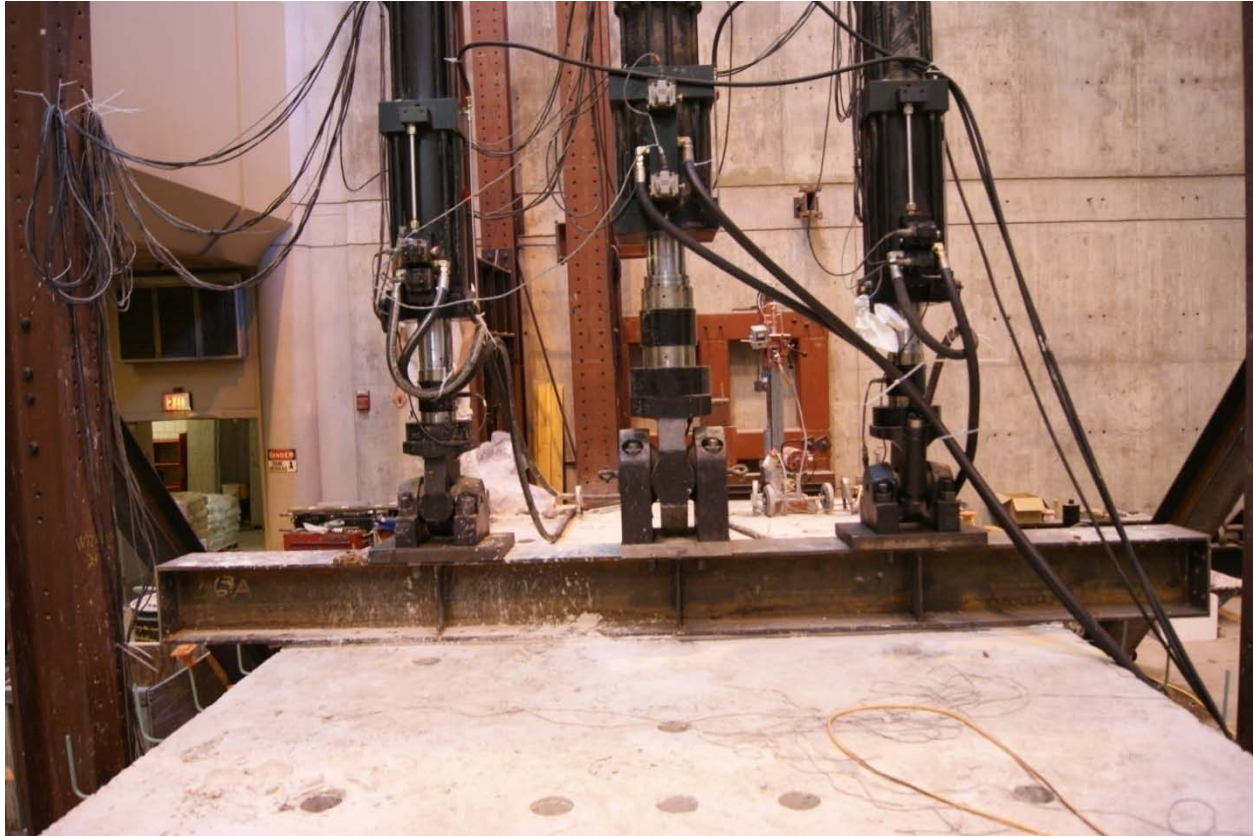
Photograph of tri-actuator load setup and transverse loading beam utilized during ultimate load tests; shown for the Concept 2 laboratory bridge test
